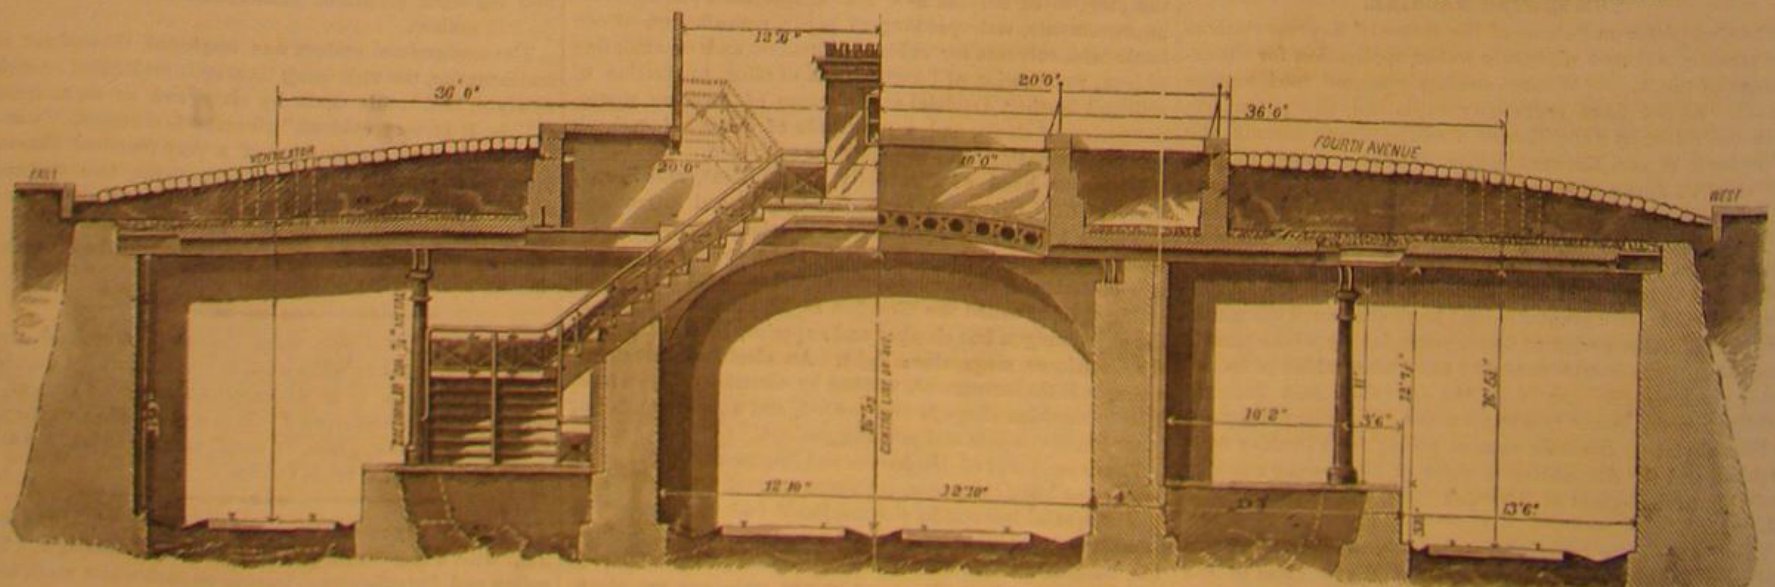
THE UNDERGROUND RAILWAY NEW YORK CITY—THE 86th STREET PASSENGER STATION.
